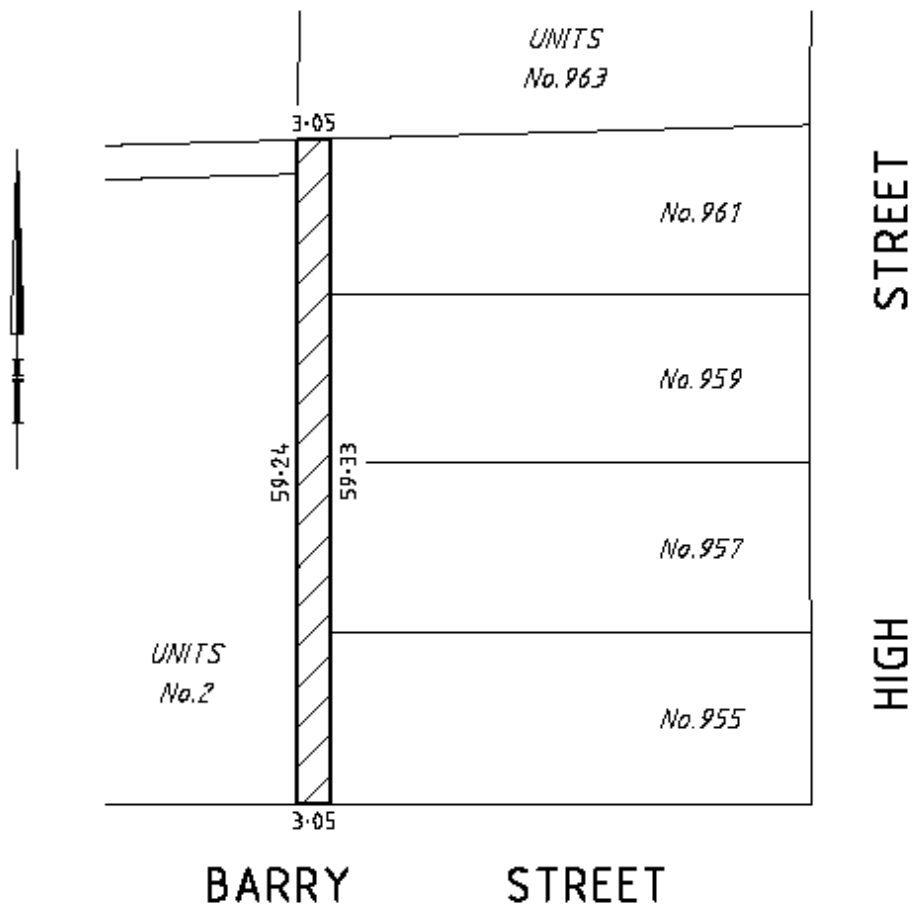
Site Plan - Road at the rear of 955 to 961 High Street and adjoining 2 Barry Street, Reservoir
